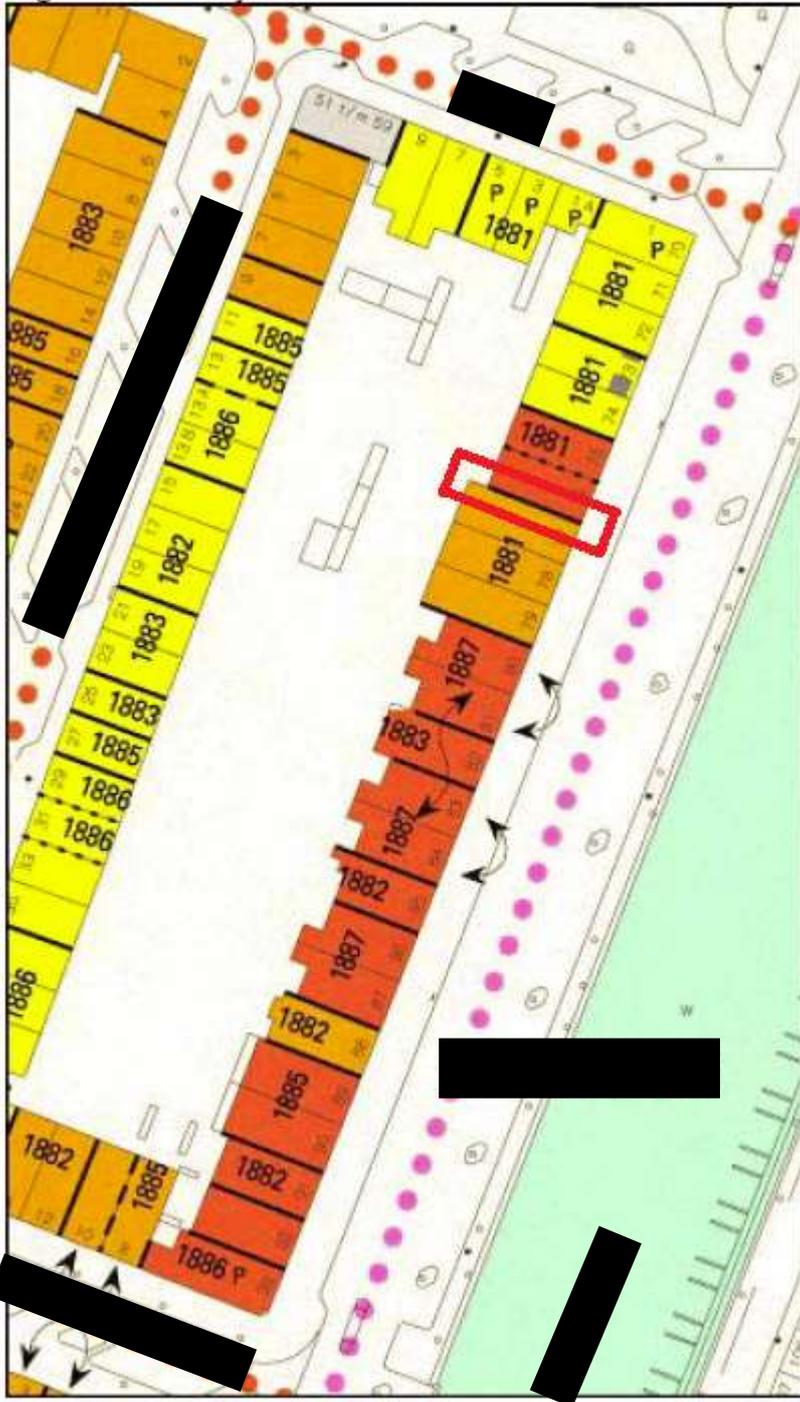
Location of boundaries between building blocks. Case Study Block B 76-77 (source: Fugro foundation reports)
